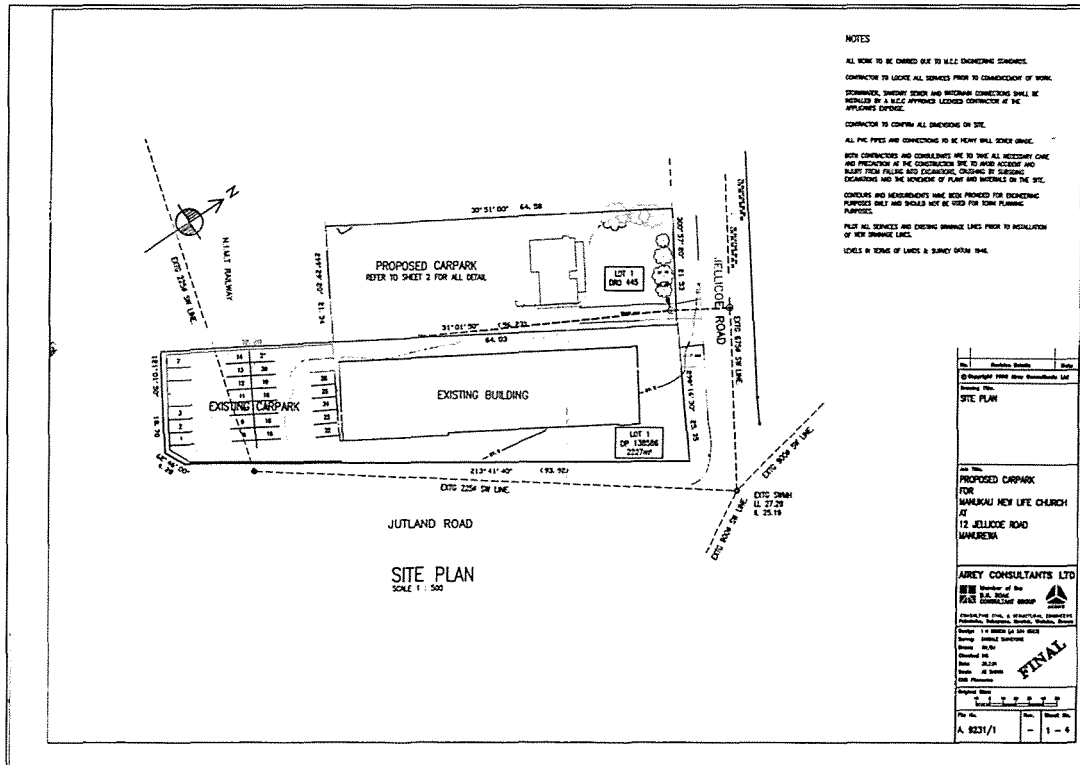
SITE LAYOUT AND ORIENTATION.
